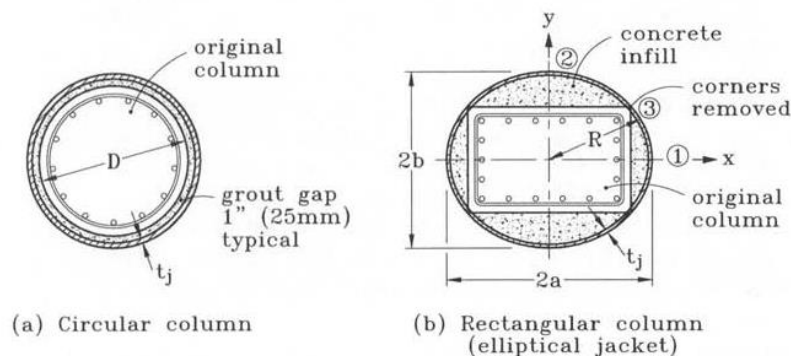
Typical Cross-section Layout of Steel Jacketing Retrofit (Priestley et al. 1996)
